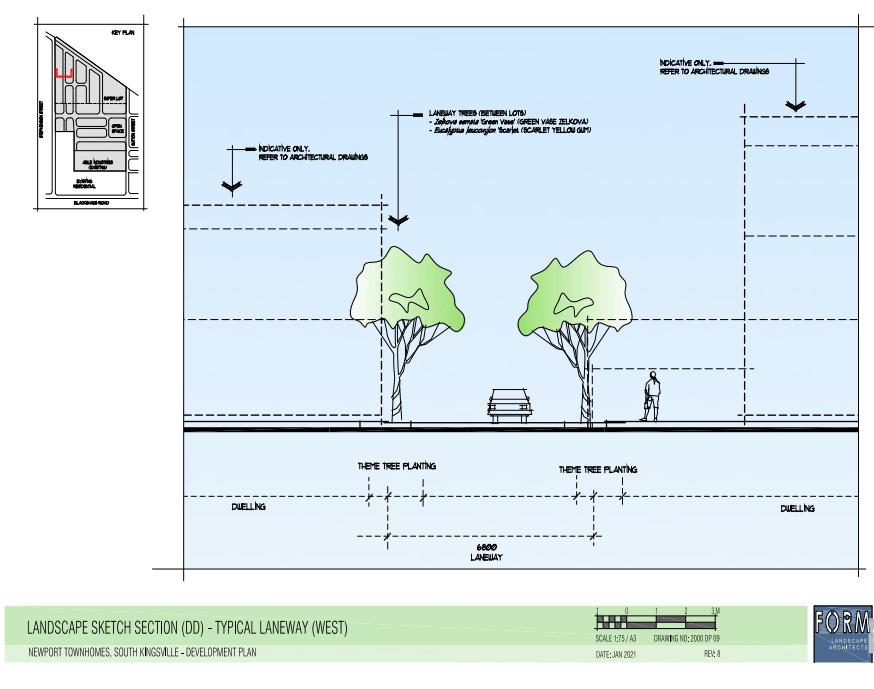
Indicative Typical Laneway - west (Source: Formium)
